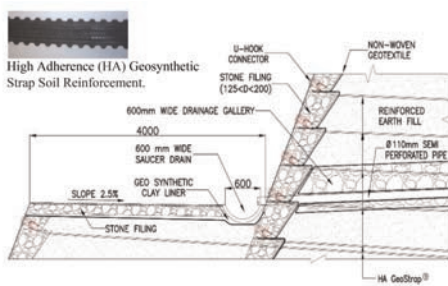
Detail showing the reinforced soil facing arrangement and mechanical connection system.
